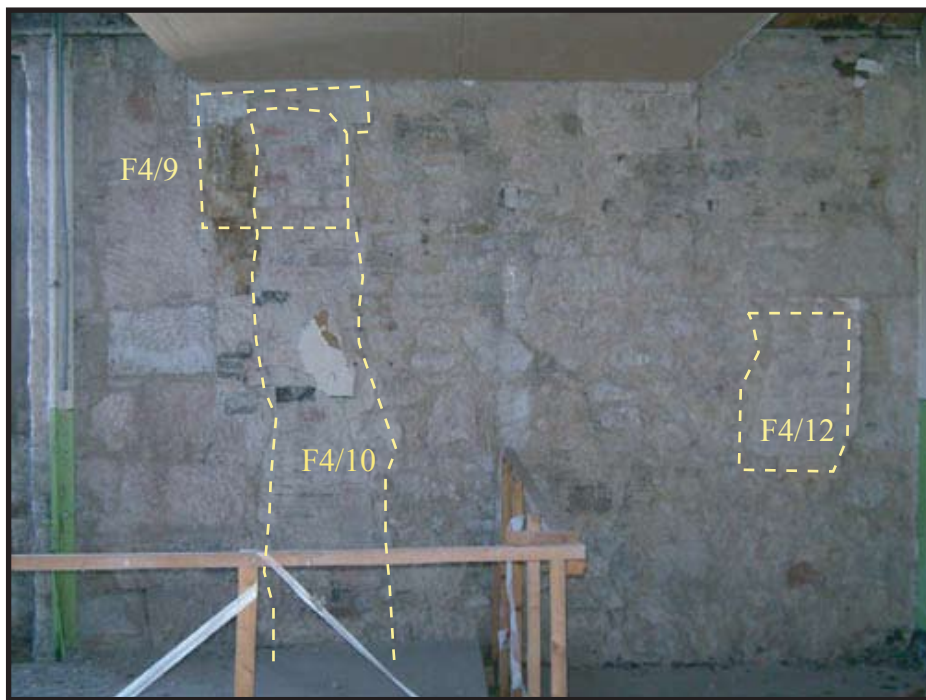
North side of the east wall showing the bearing box F4/9 plus area of brick wall F4/10 & F4/12
